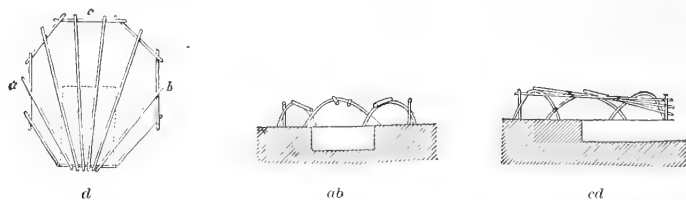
Plan and sections of qarmang or house made of whale ribs.
